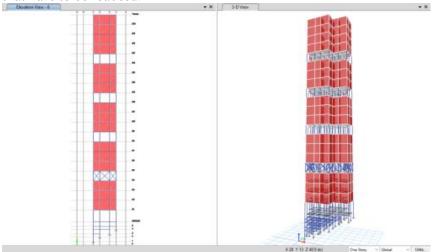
Elevation & 3D view of the building with bracing at 4th floor on 25° sloping ground
